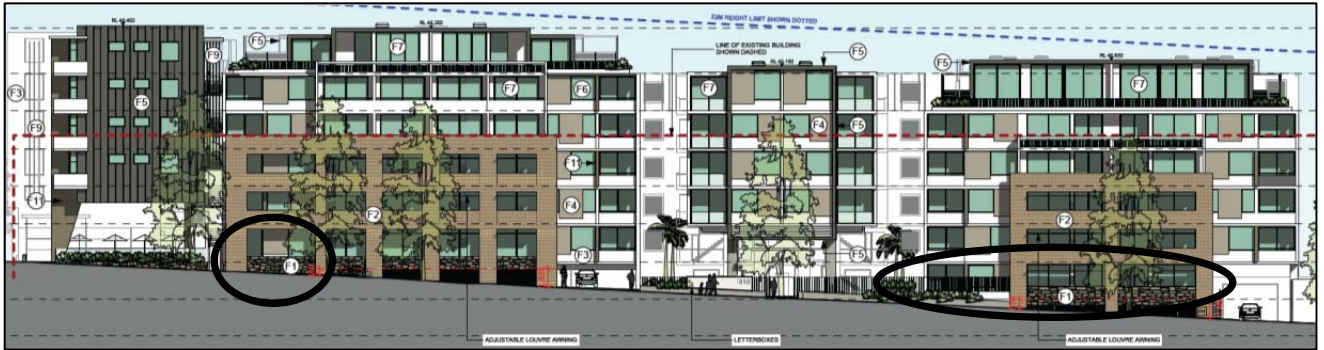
The location of ground floor apartments on the Elizabeth Street (western elevation) frontage of the site that are capable of accommodating an individual entry.
